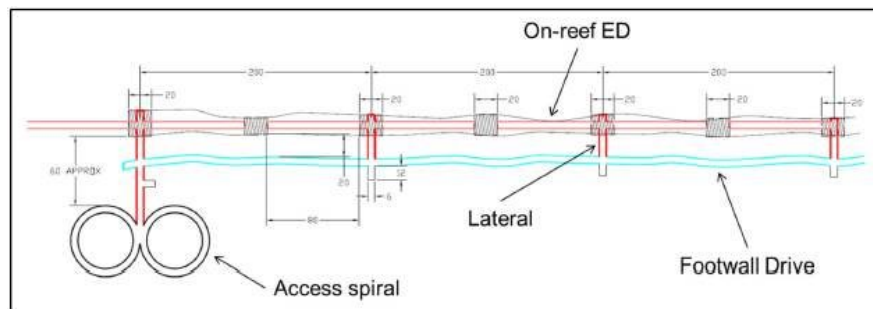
SLOS Longitudinal Sub-level with Footwall Drive
